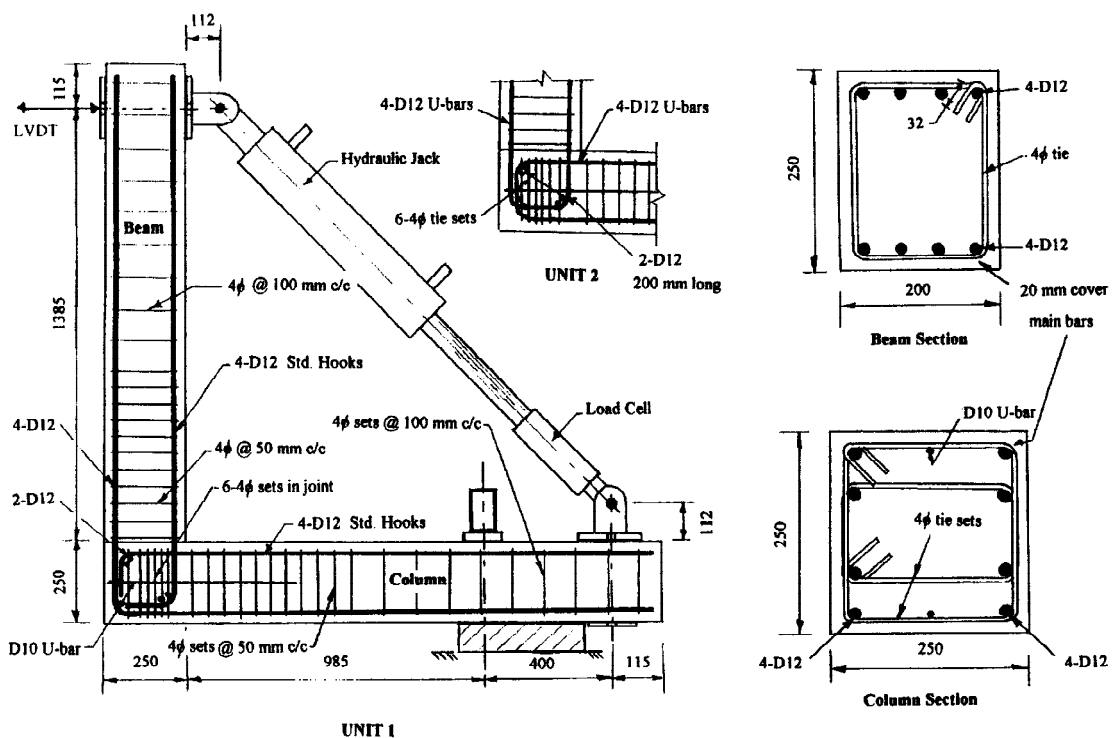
Knee Joints 1 and 2 showing loading set up.
